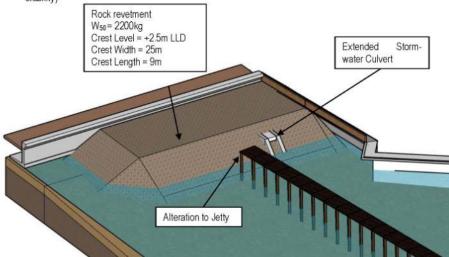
Proposed conceptual seawall revetment at Bart's Corner, isometric view.
